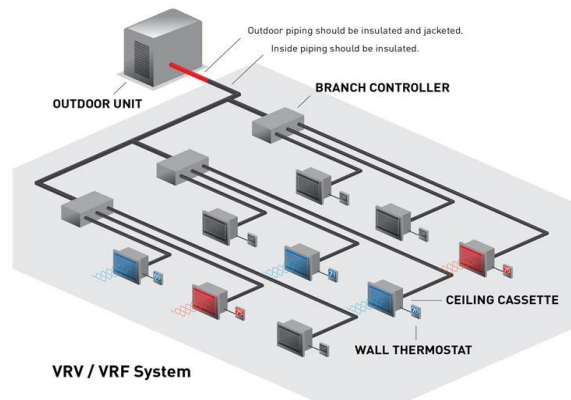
Schematic drawing of VRF system showing single outdoor unit with multiple indoor units. (ACHR News)
